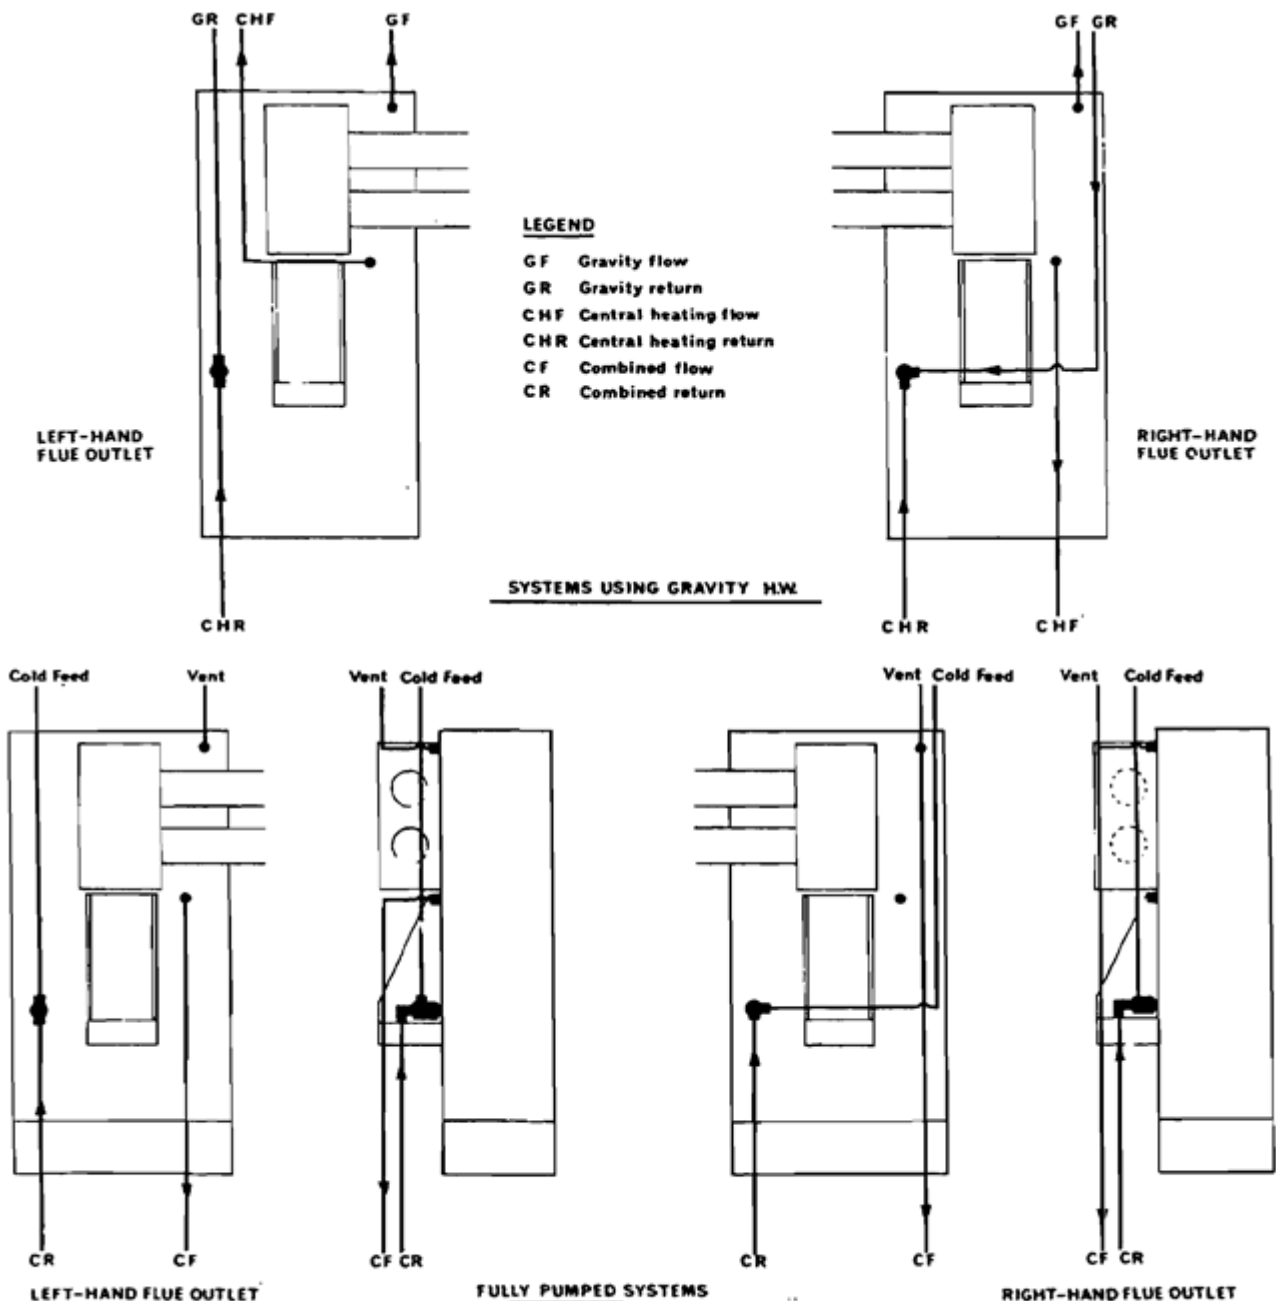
SUGGESTED PIPEWORK VIEWED FROM BEHIND BOILER
